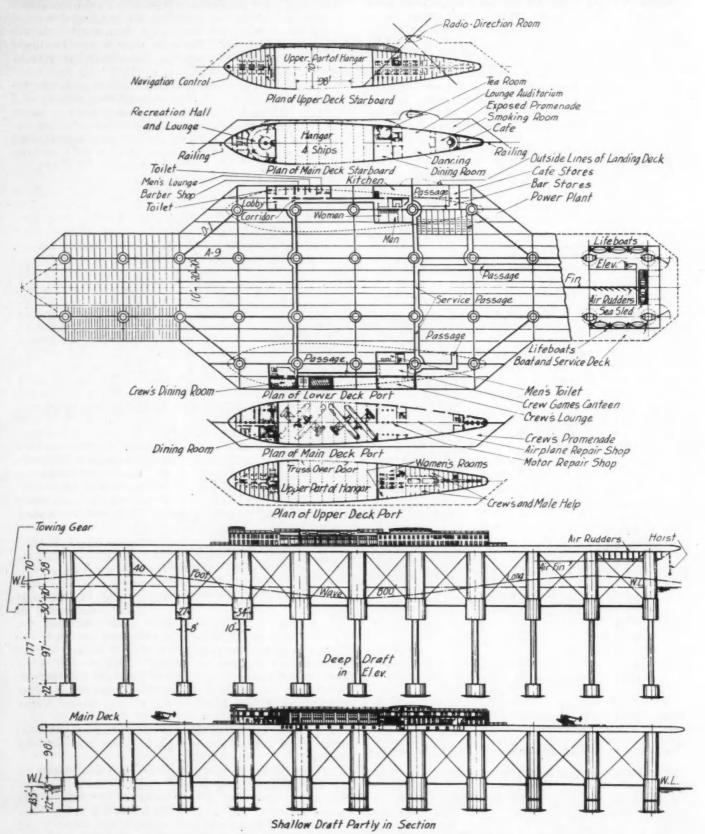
PLAN AND ELEVATION OF SEADROME, SHOWING RELATIVE DRAFT WITH BALLAST COLUMNS EXTENDED AND WITH THEM TELESCOPED INTO THE BUOYANCY COLUMNS
